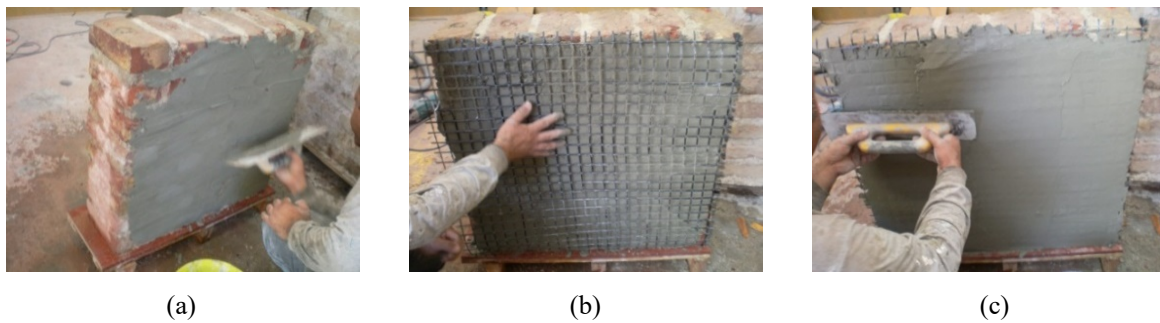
Installation phases of FRCM system (a) plastering, (b) application of open-grid textile, and (c) application of second layer plastering
